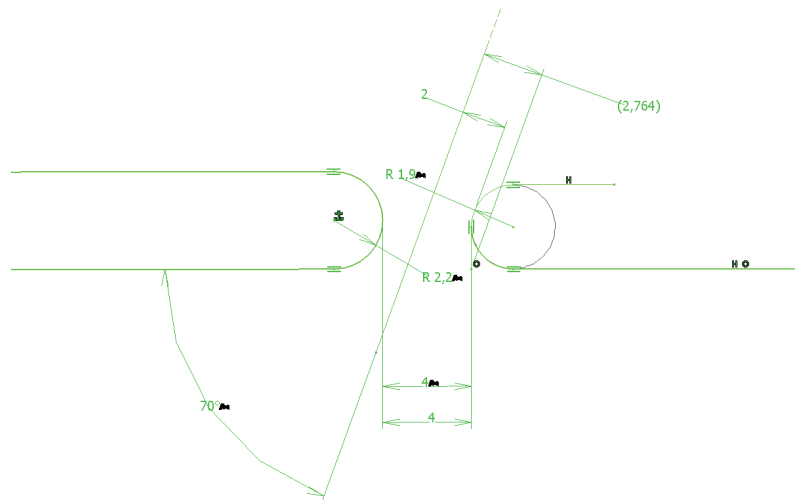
Reference section corner door without crash profile – Under consideration of door opening angle 70° and clearance (2mm) the minimum distance between theoretical door corner and outer pillar surface is 2.764 mm.
